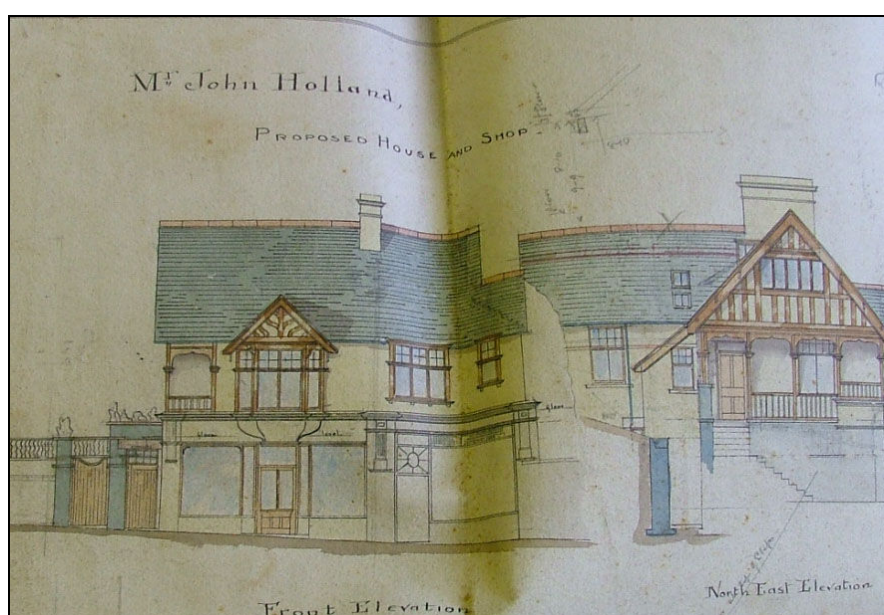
Proposed elevations for Mr Holland's shop and house dated 1896
